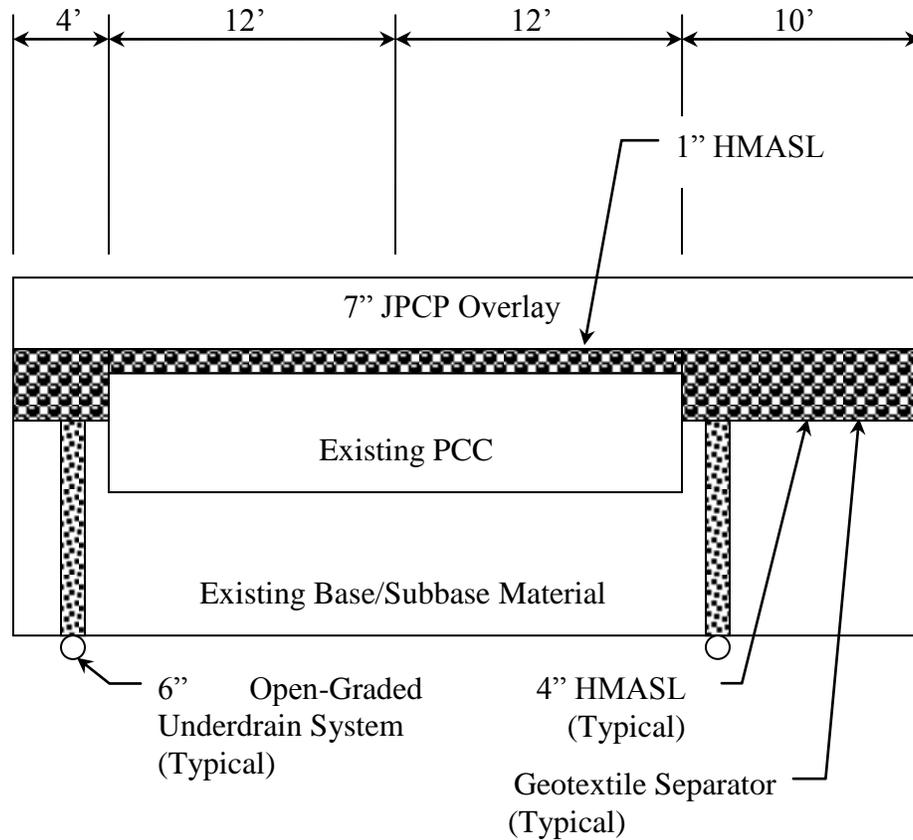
New Overlay Drainage System: Thickened Shoulder Design with Open-Graded Underdrains (depending on soil conditions).
